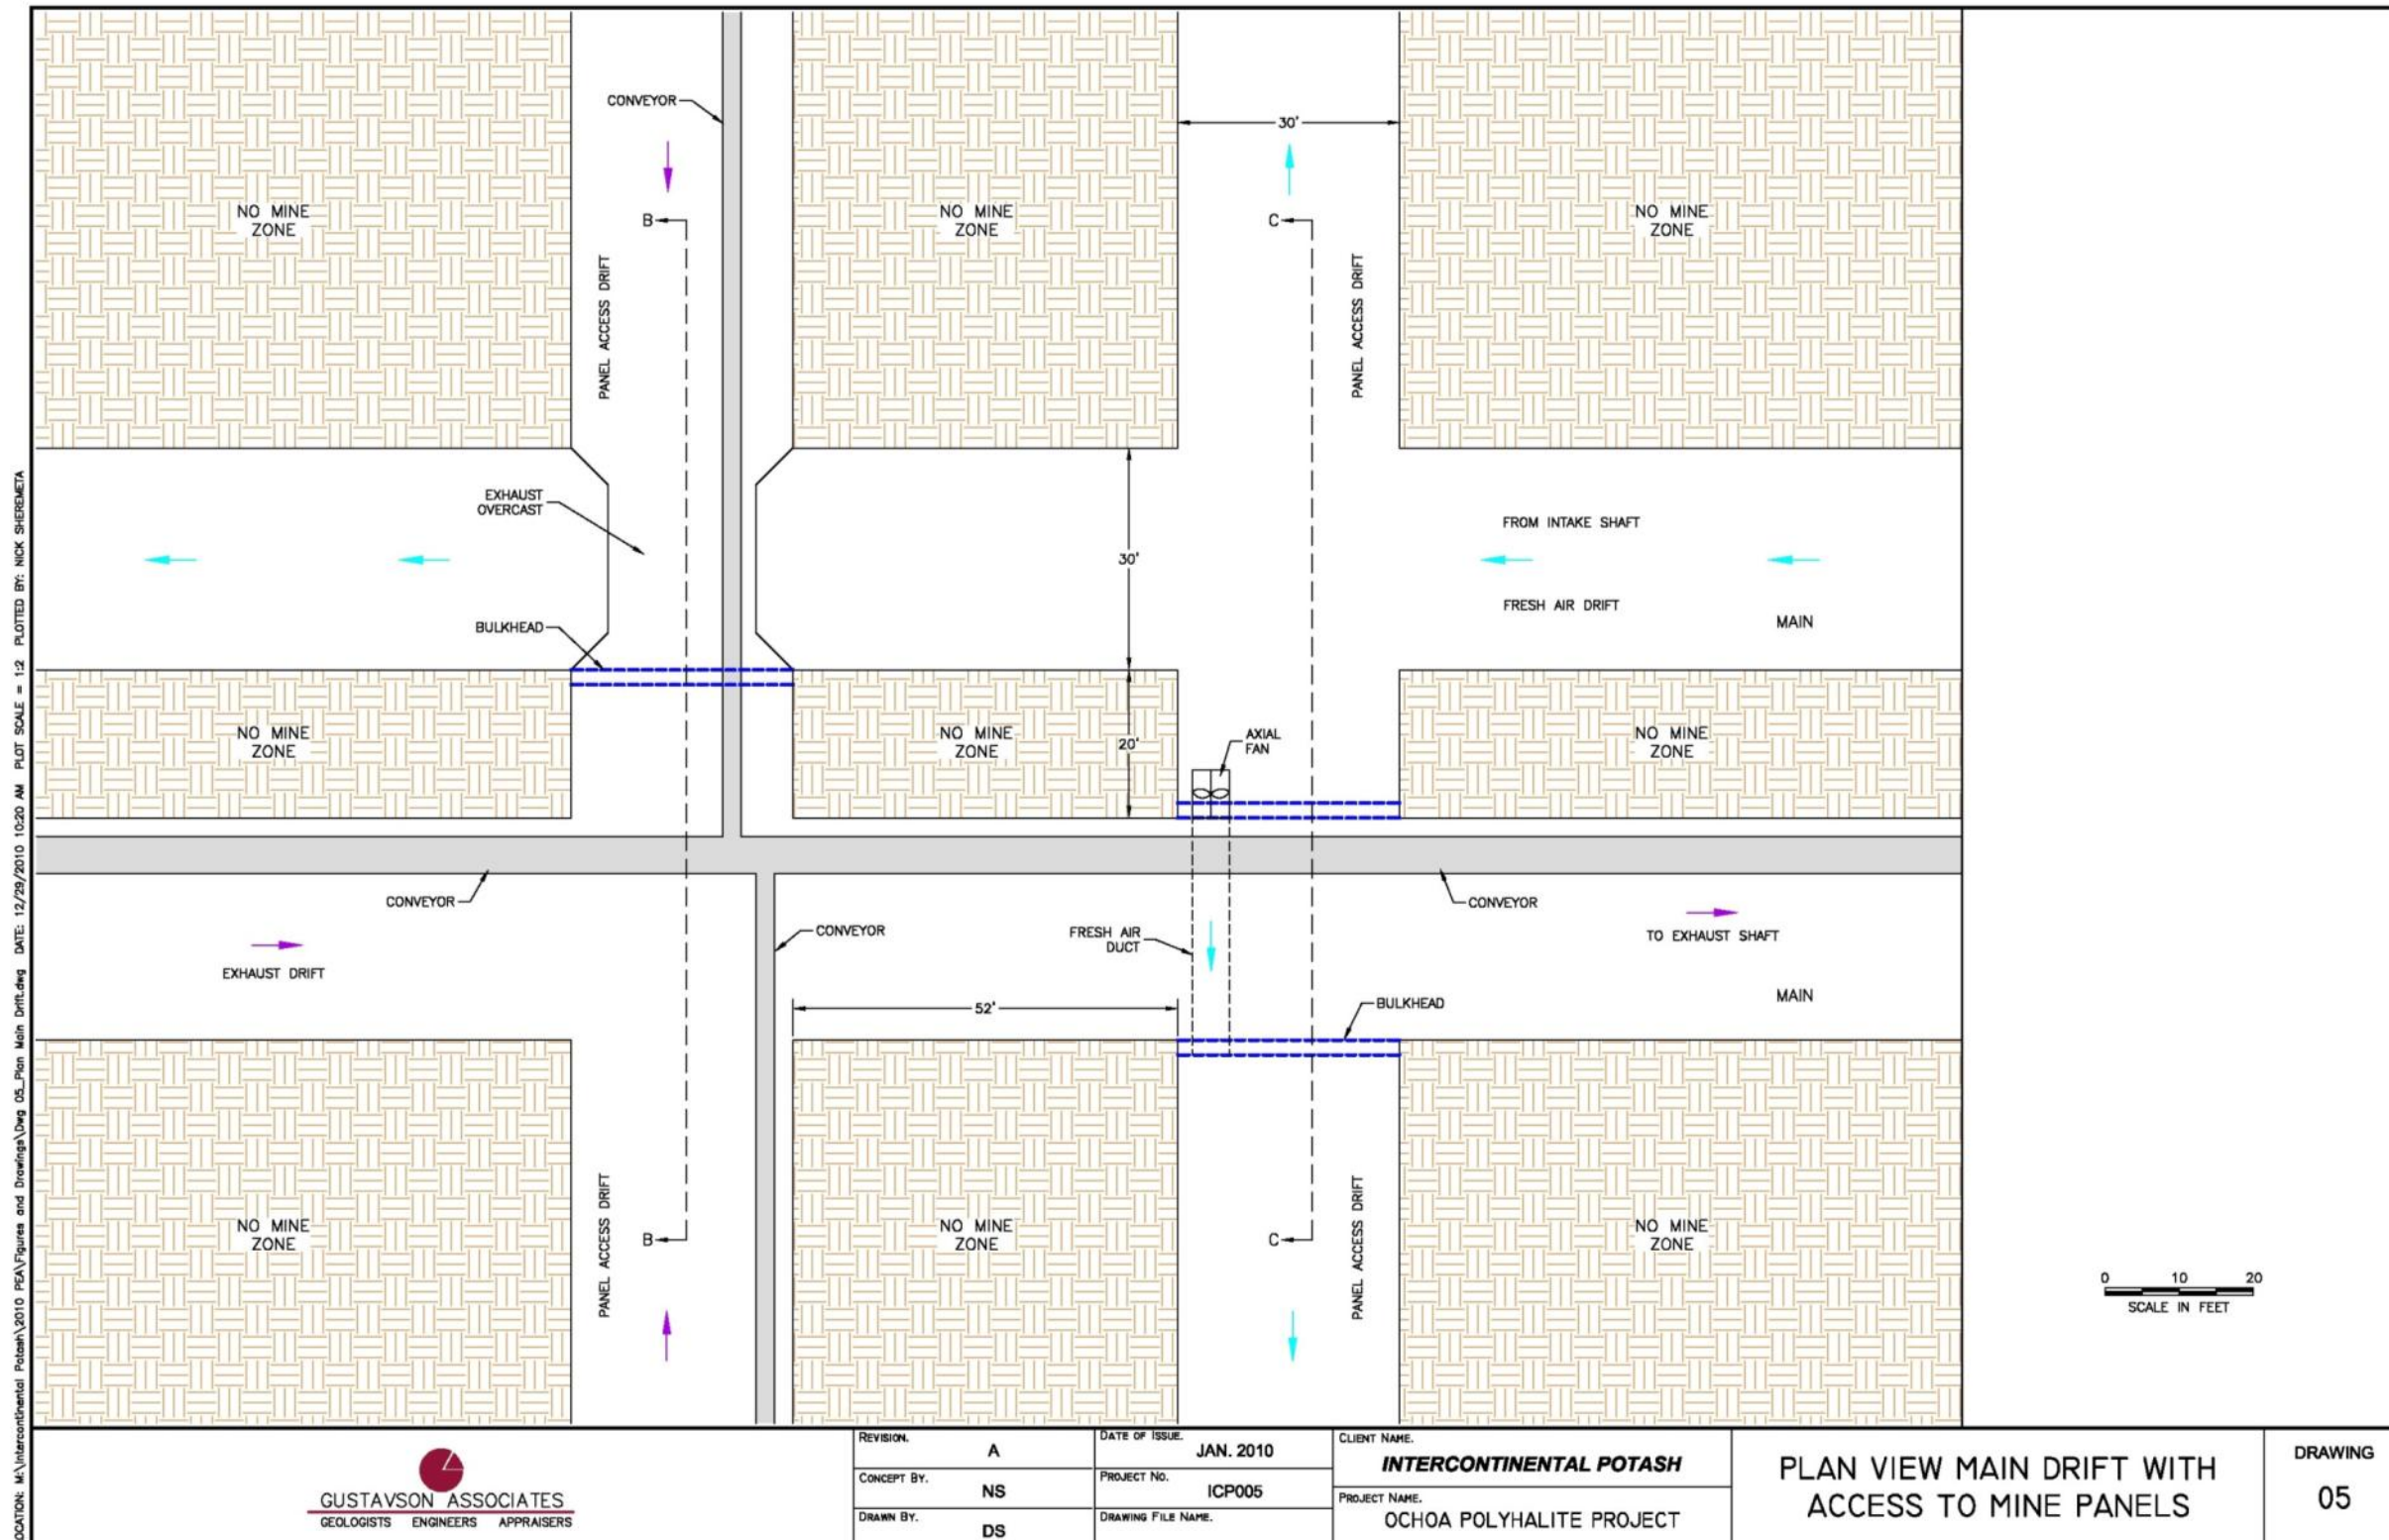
PLAN VIEW MAIN DRIFT WITH ACCESS TO MINE PANELS
